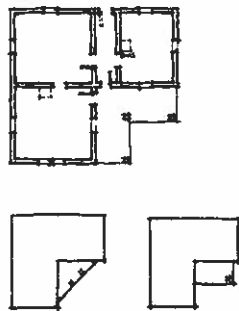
The L-Plan. Floor plans from the Tenth Street Historic District, showing porch forms.
